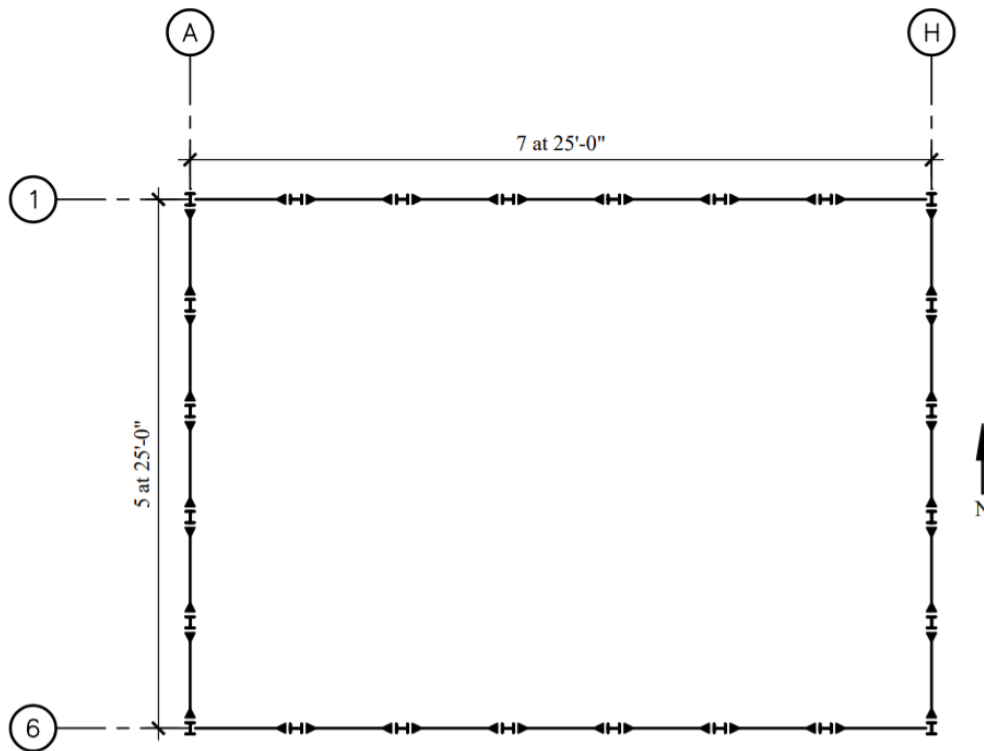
Design example SMRF framing plan (FEMA, 2006).
